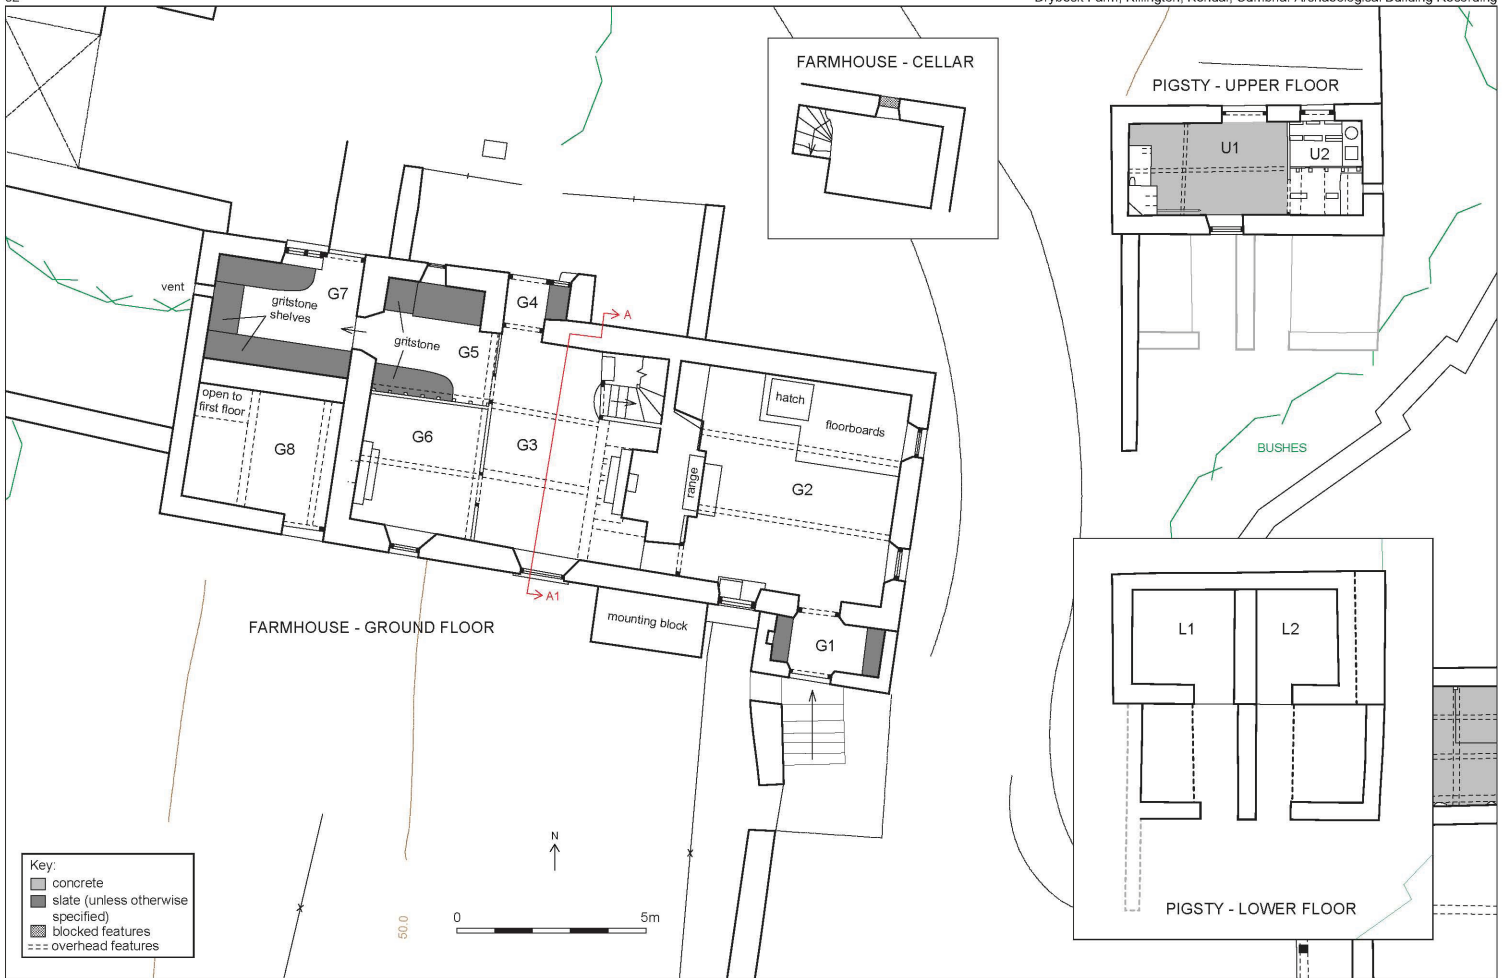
Ground floor and cellar plans of the farmhouse and upper and lower floor plans of the pigsty
